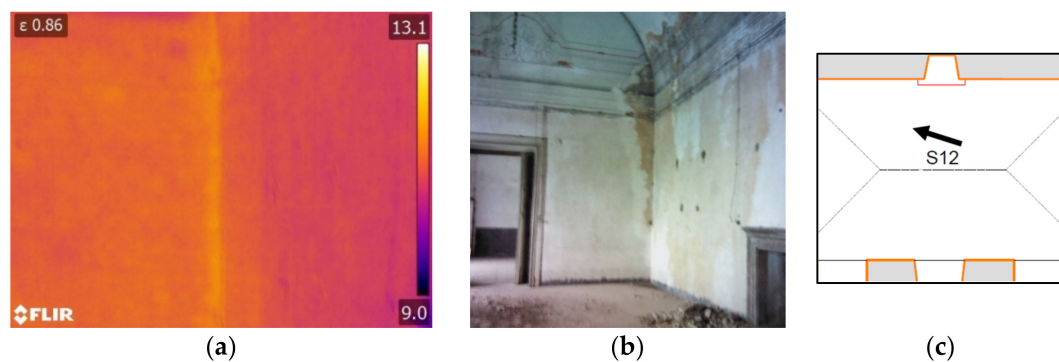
Room S12: (a) infrared image, (b) photography view and (c) plan view.
